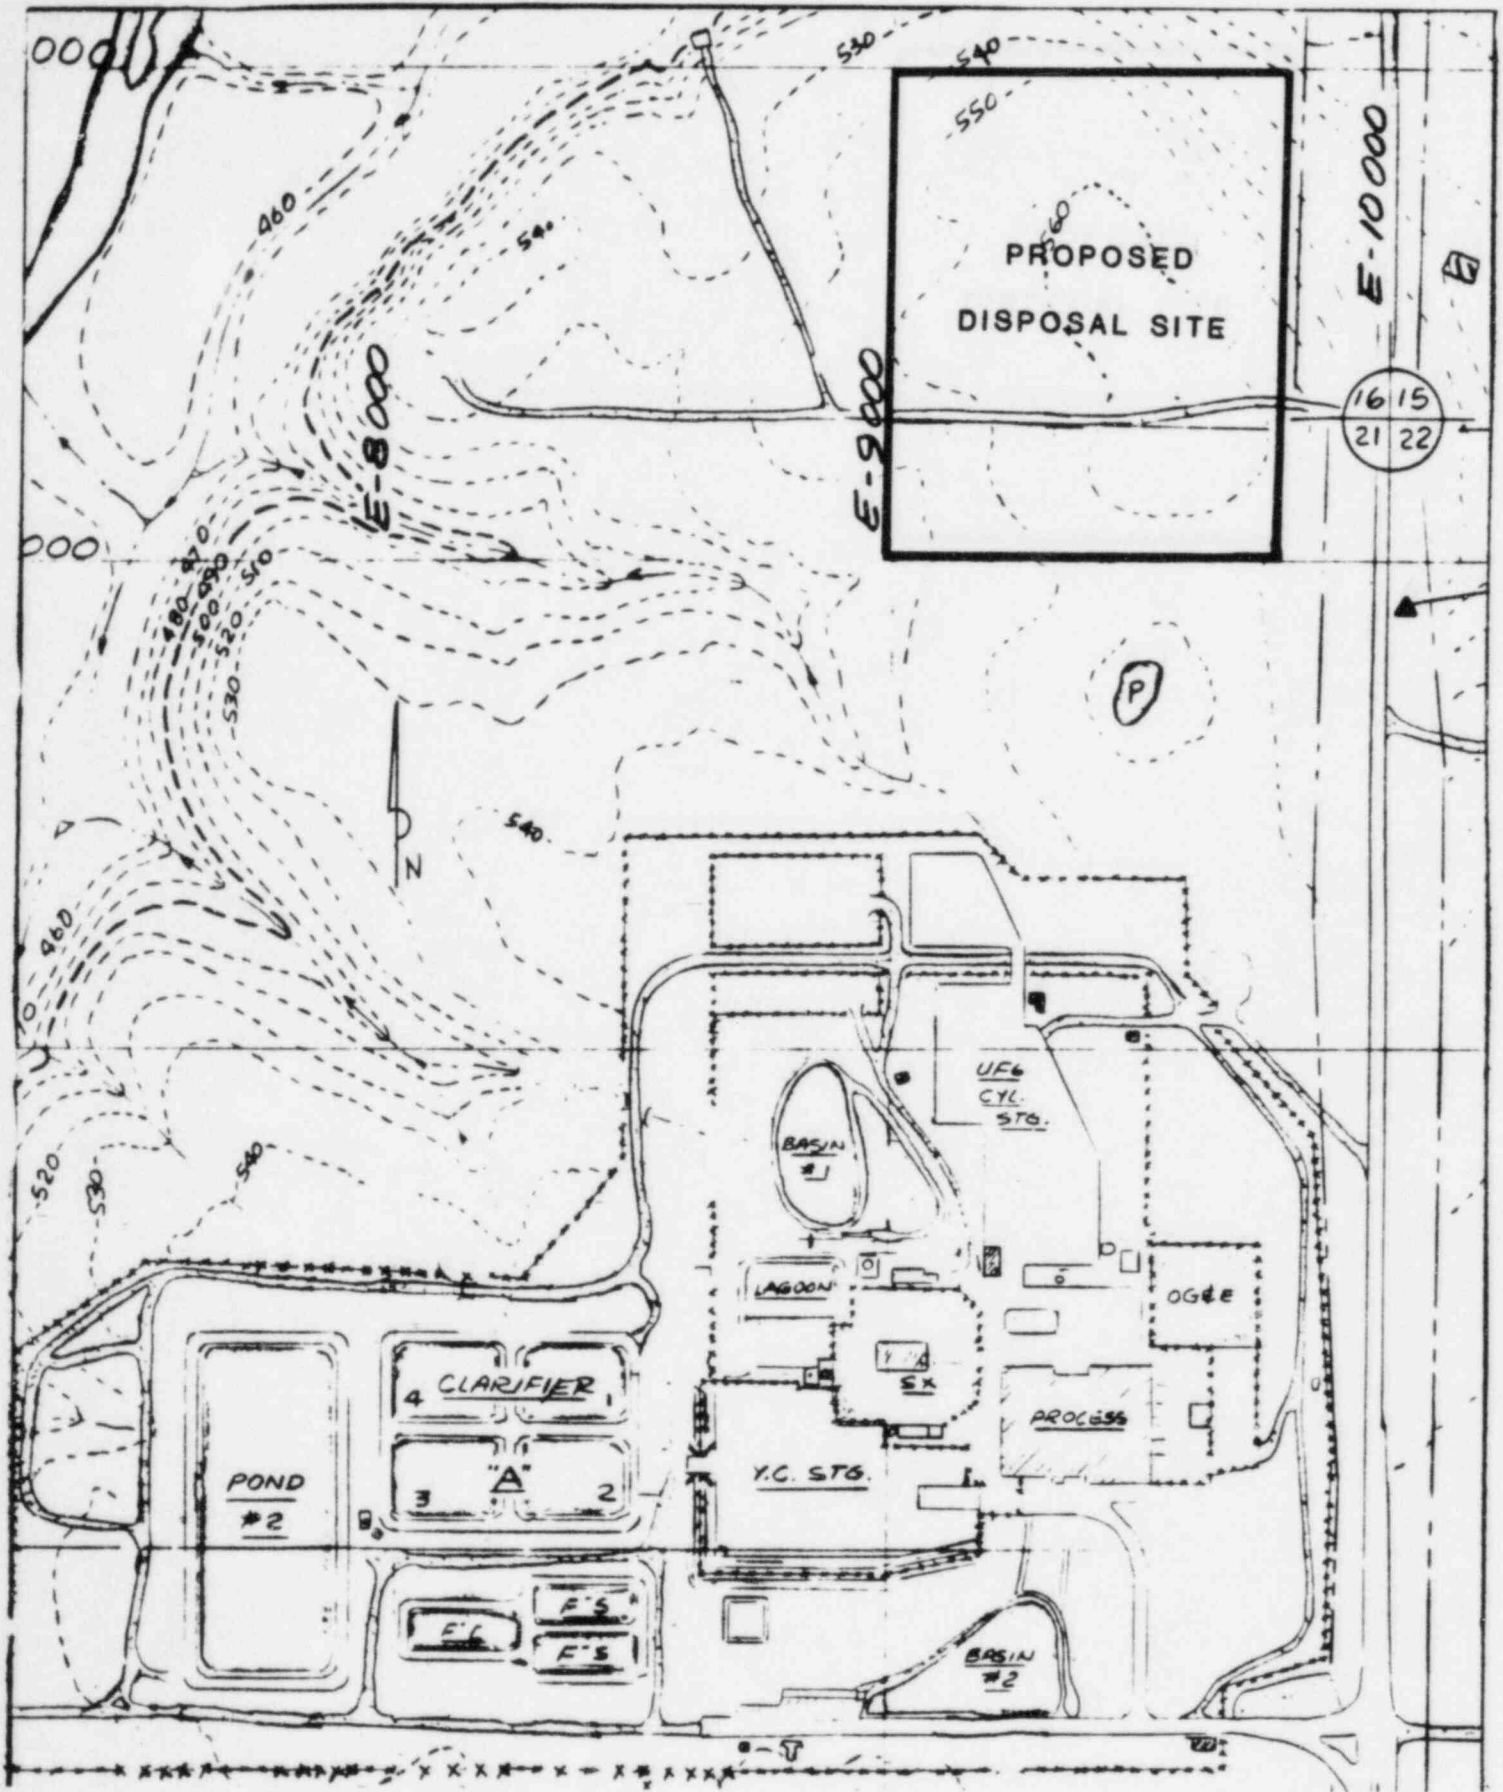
PROPOSED DISPOSAL SITE - SEQUOYAH FACILITY
